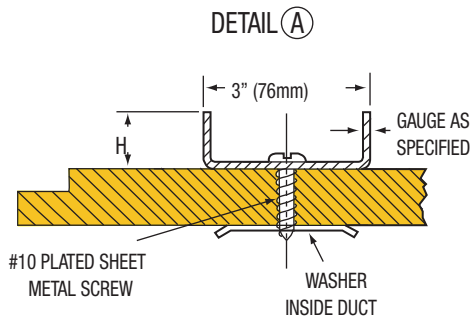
A. Channel Reinforcement, Approx. 48" (1,219mm) on Centers, 48" (1,219mm) Duct Modules
